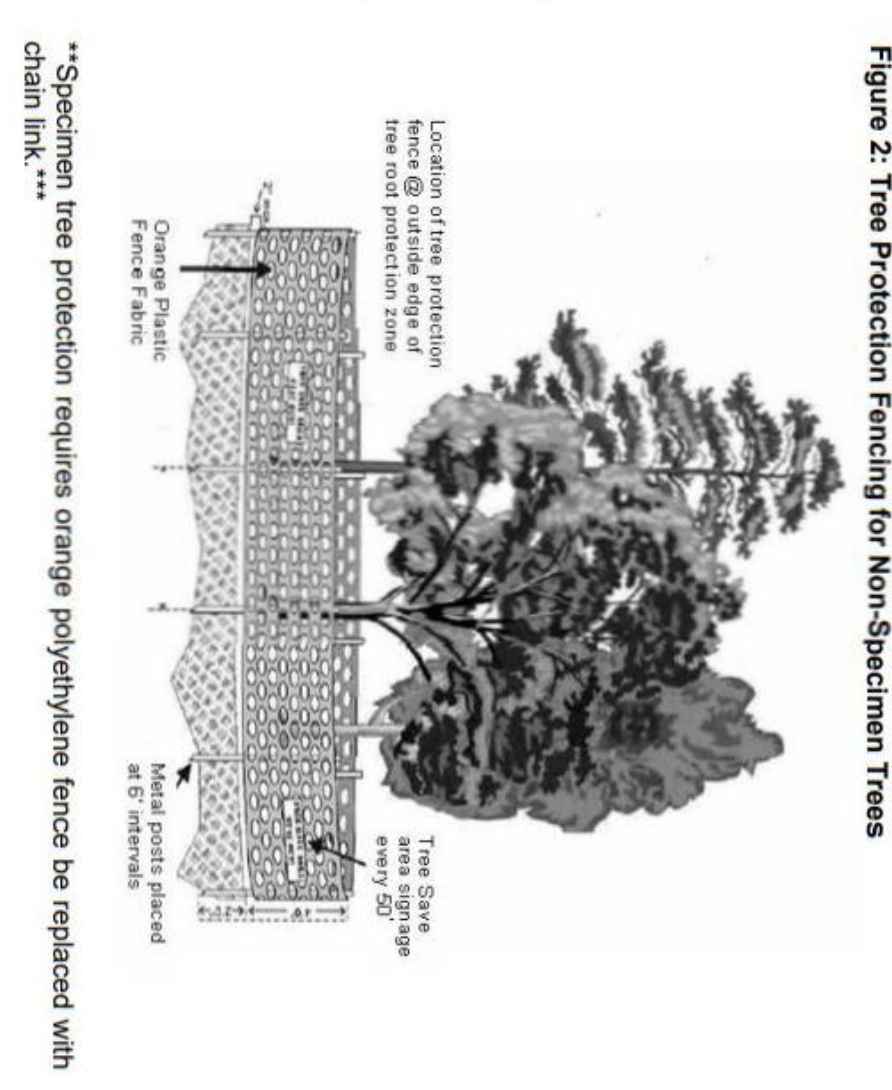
Tree Protection Fencing for Non-Specimen Trees
